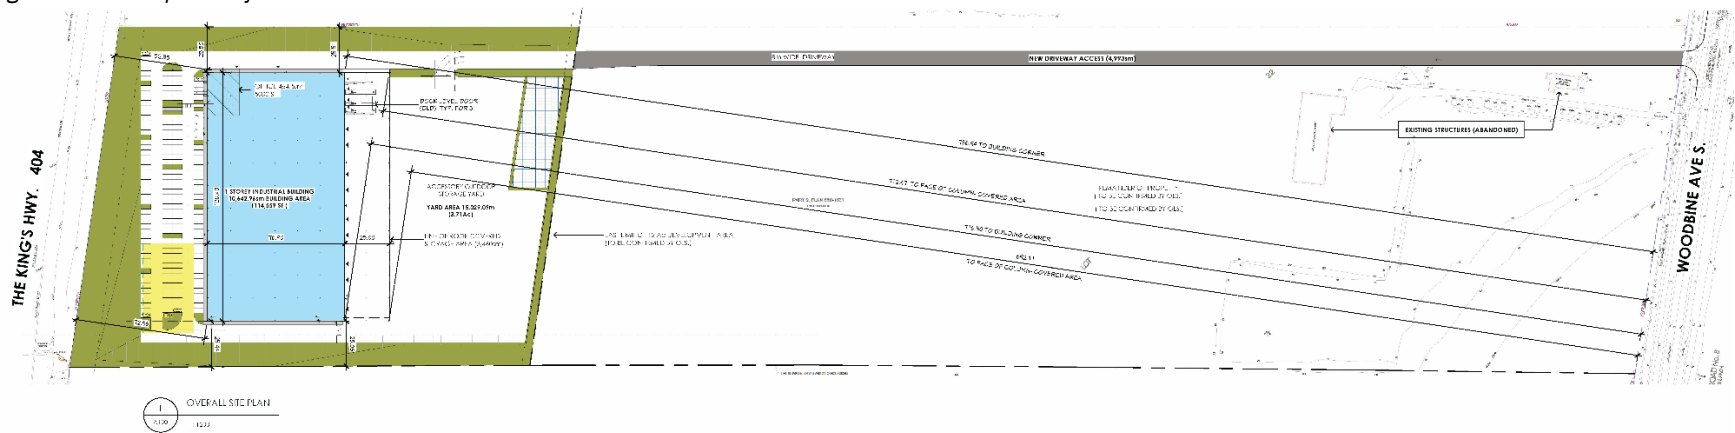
below shows the proposed development concept and Figure 2.2 shows the proposed development in context of the extent of the Subject Lands.
